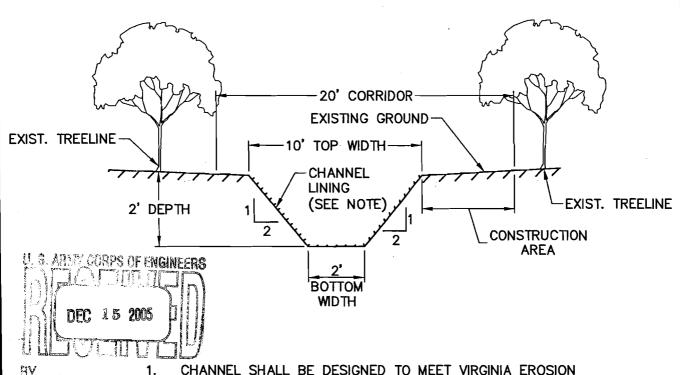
TYPICAL CROSS-SECTION R1 NEWTOWN - SECTIONS 7, 8 & REMAINING 9 JAMES CITY COUNTY, VIRGINIA
